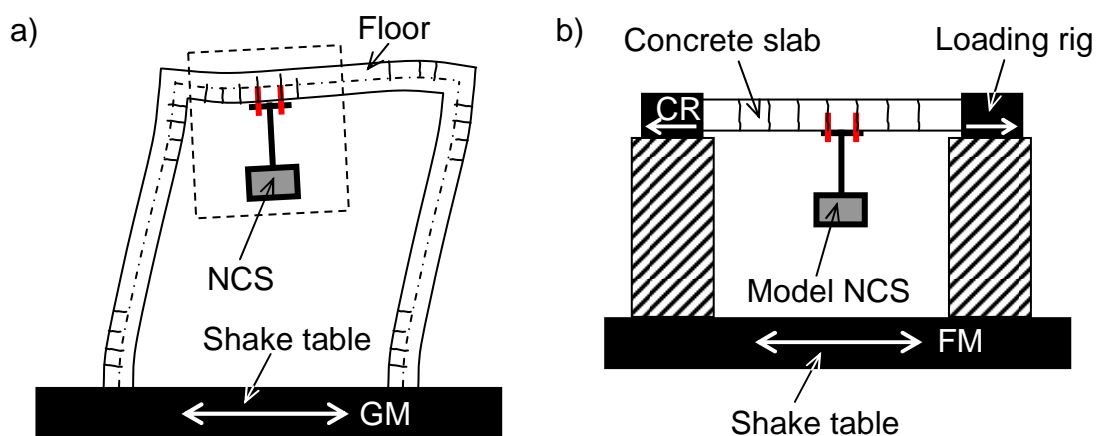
Schematic of test setups for testing anchored components: a) Full-scale model building; b) Segment of the structure
